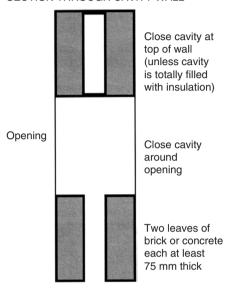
Masonry cavity walls excluded from the previous for cavity barriers
